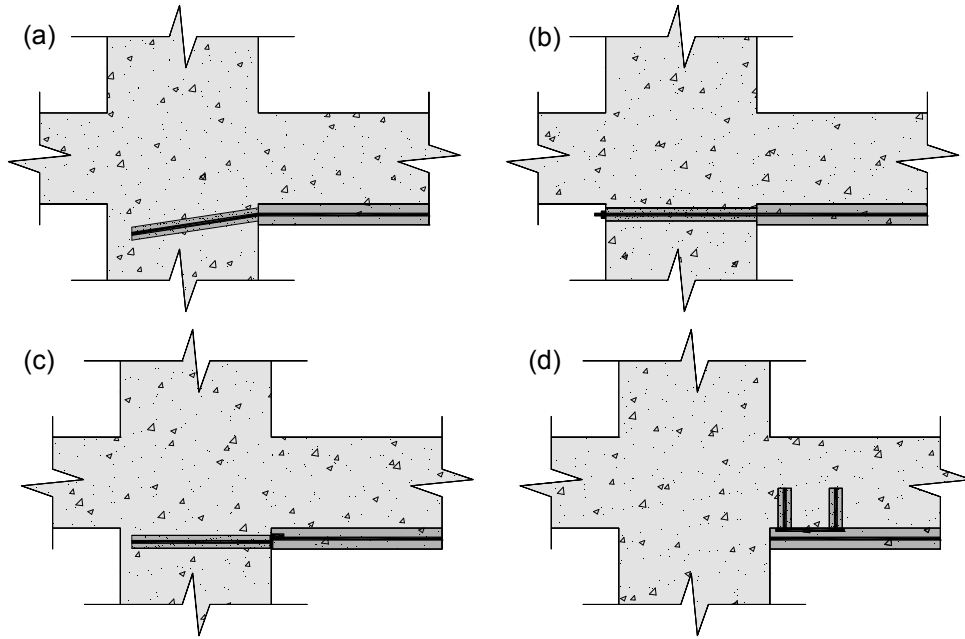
Different types of anchorage, adopted from Gomes and Appleton (1997). This example is in the context of strengthened concrete beams.
